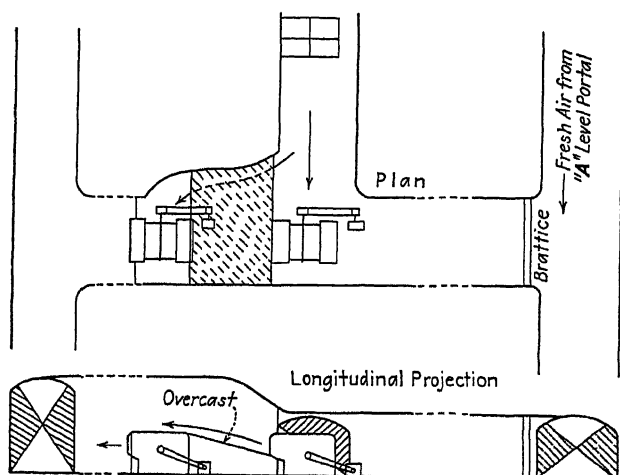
PARALLEL SET-UP OF TWO EXHAUST FANS ON A LEVEL.
